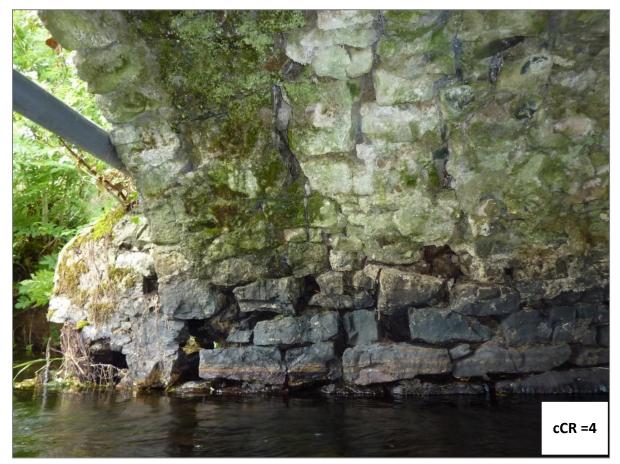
Washout and Pier Failure (arch breaking into discrete sections)
